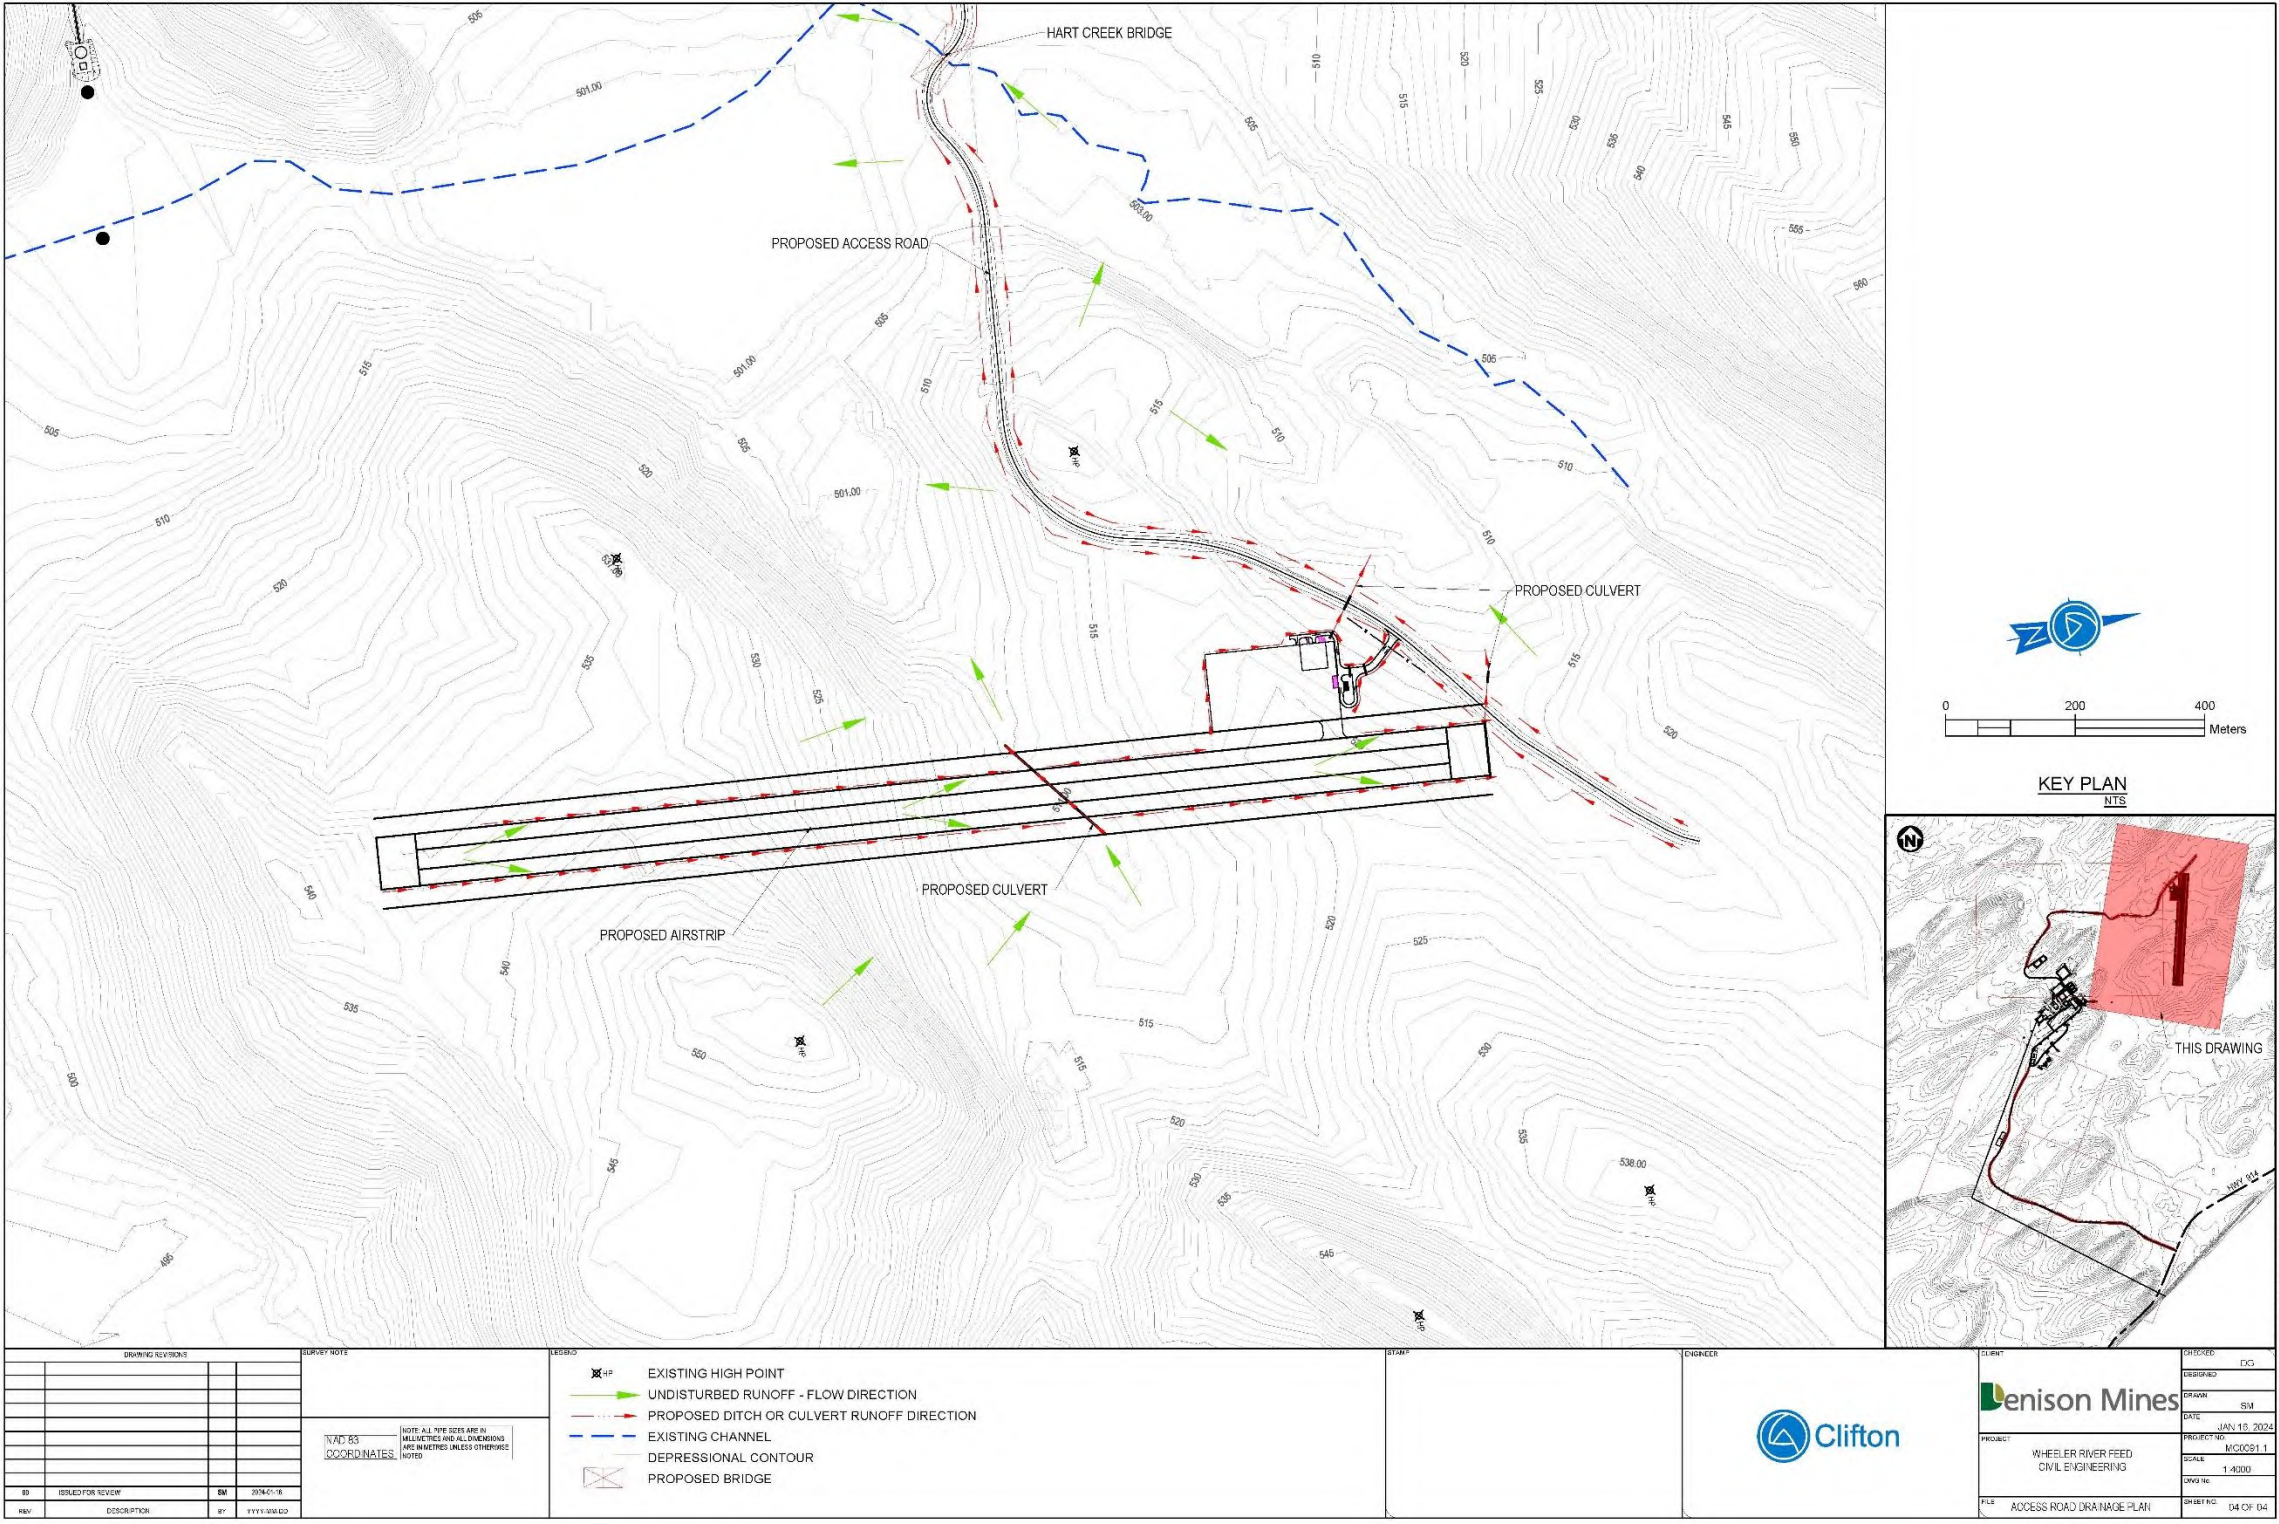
4: Conceptual Site Drainage – Near Airstrip
